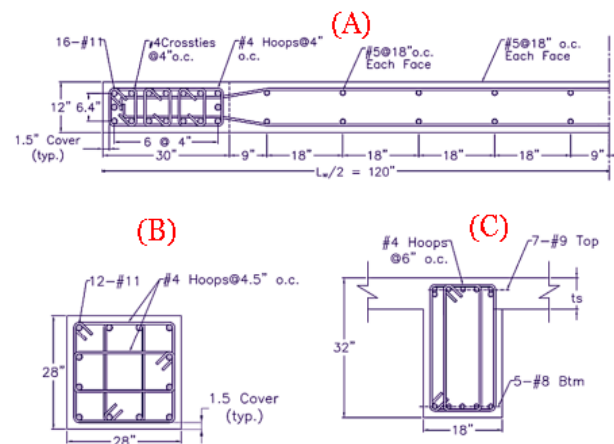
The specifications of the member cross sections: (A) wall, (B) column, and (C) beam [30]
